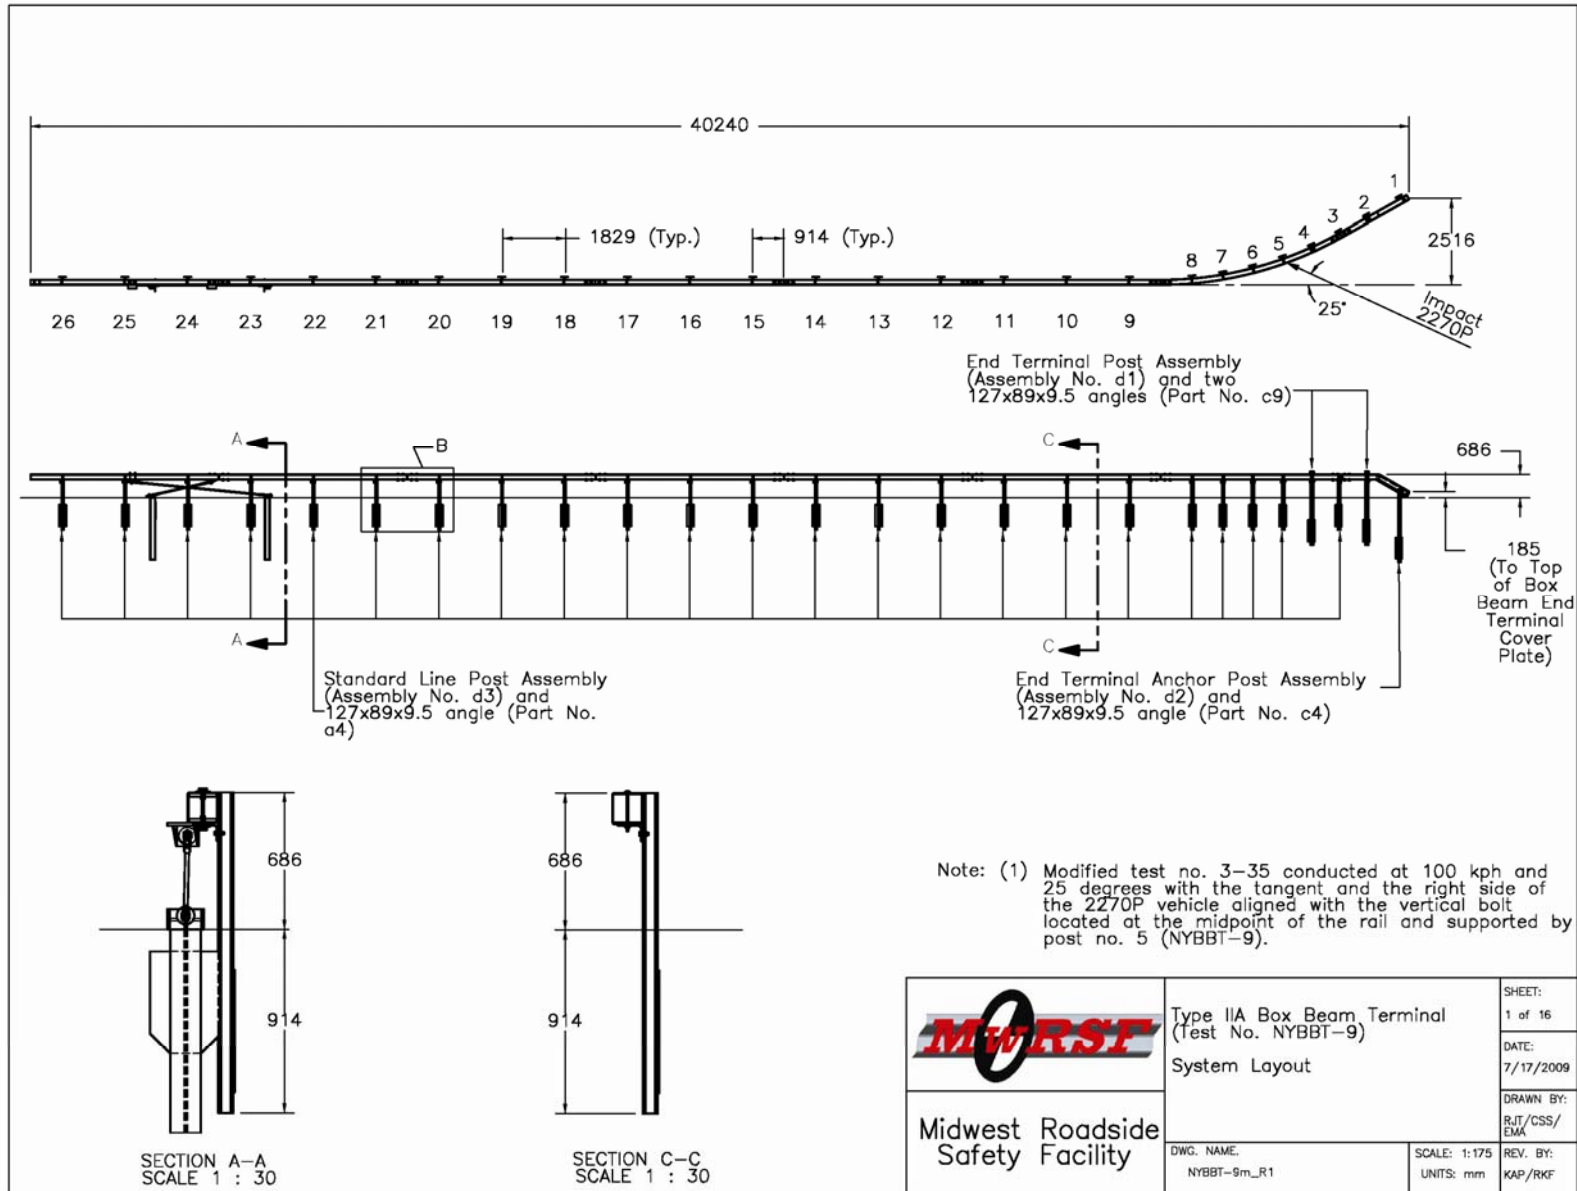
Modified Type IIA Box Beam Terminal System Details, Test No. NYBBT-9
